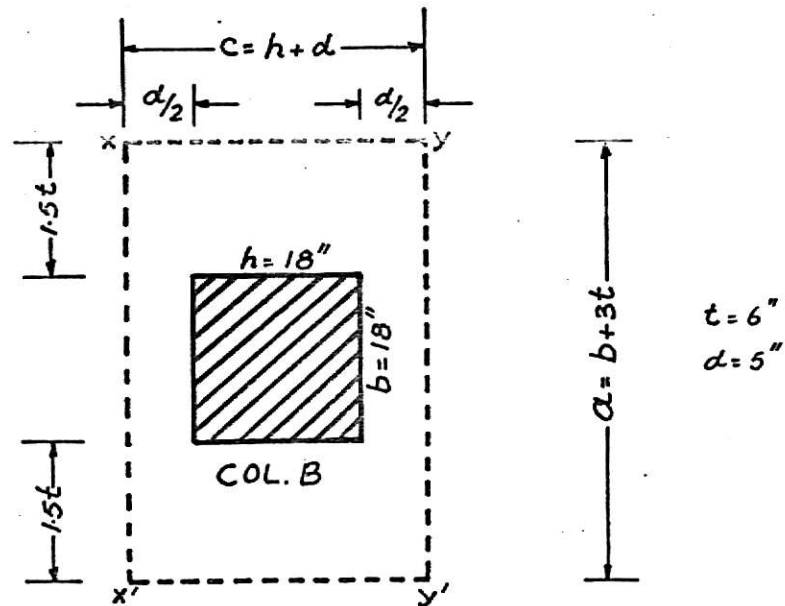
TOP PLAN AT COLUMN B, METHOD I.
